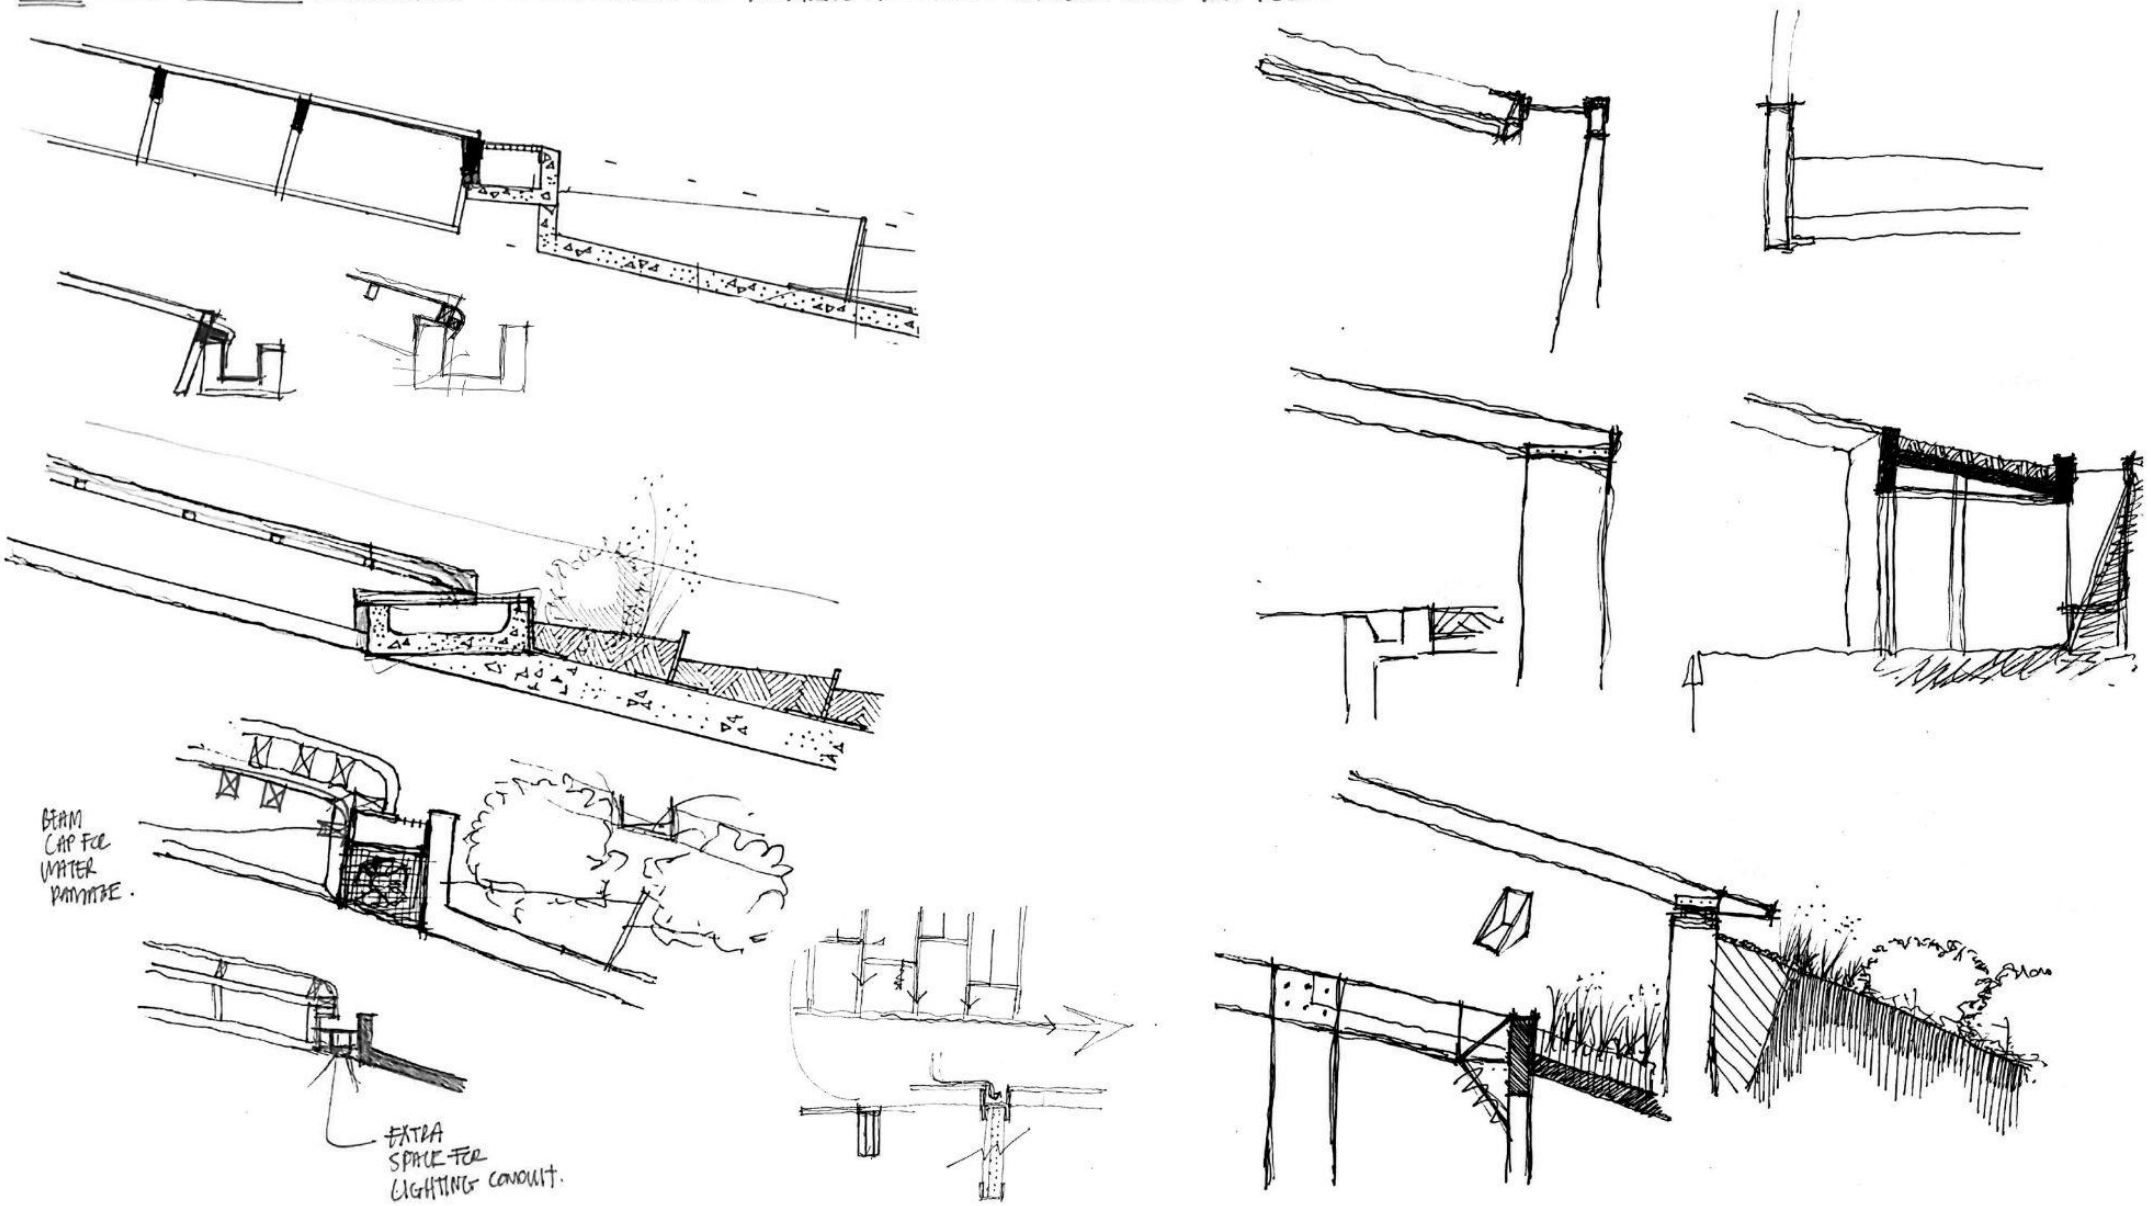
Iterations attempting to create a seamless connection between roof and landscape (Author, 2021)
